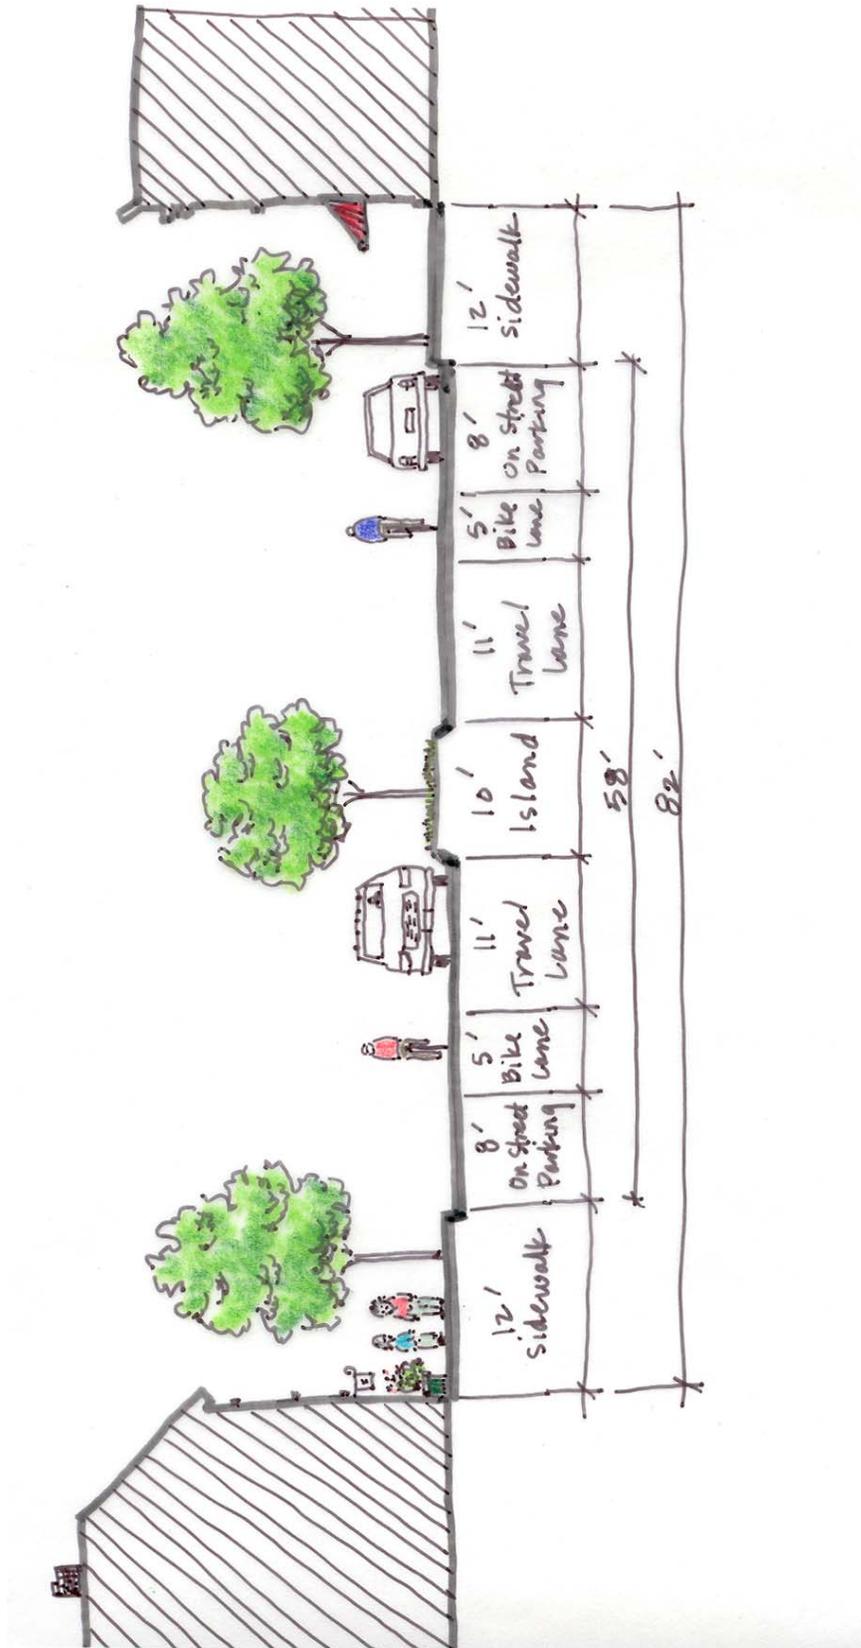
Proposed Cross Section of Route 7 with On Street Parking
